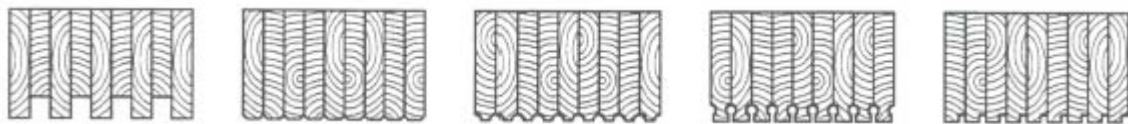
Various Soffit Profiles of VNP (Vertical Nailed Plank) Floors
